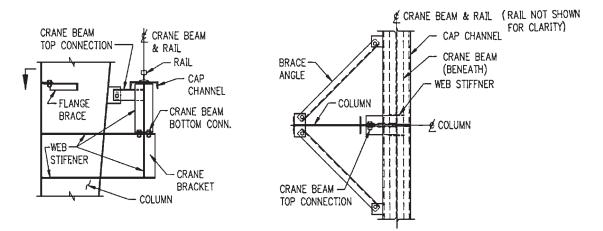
Bracket-supported runway beam for top-running crane. (Metallic Building Systems.)
